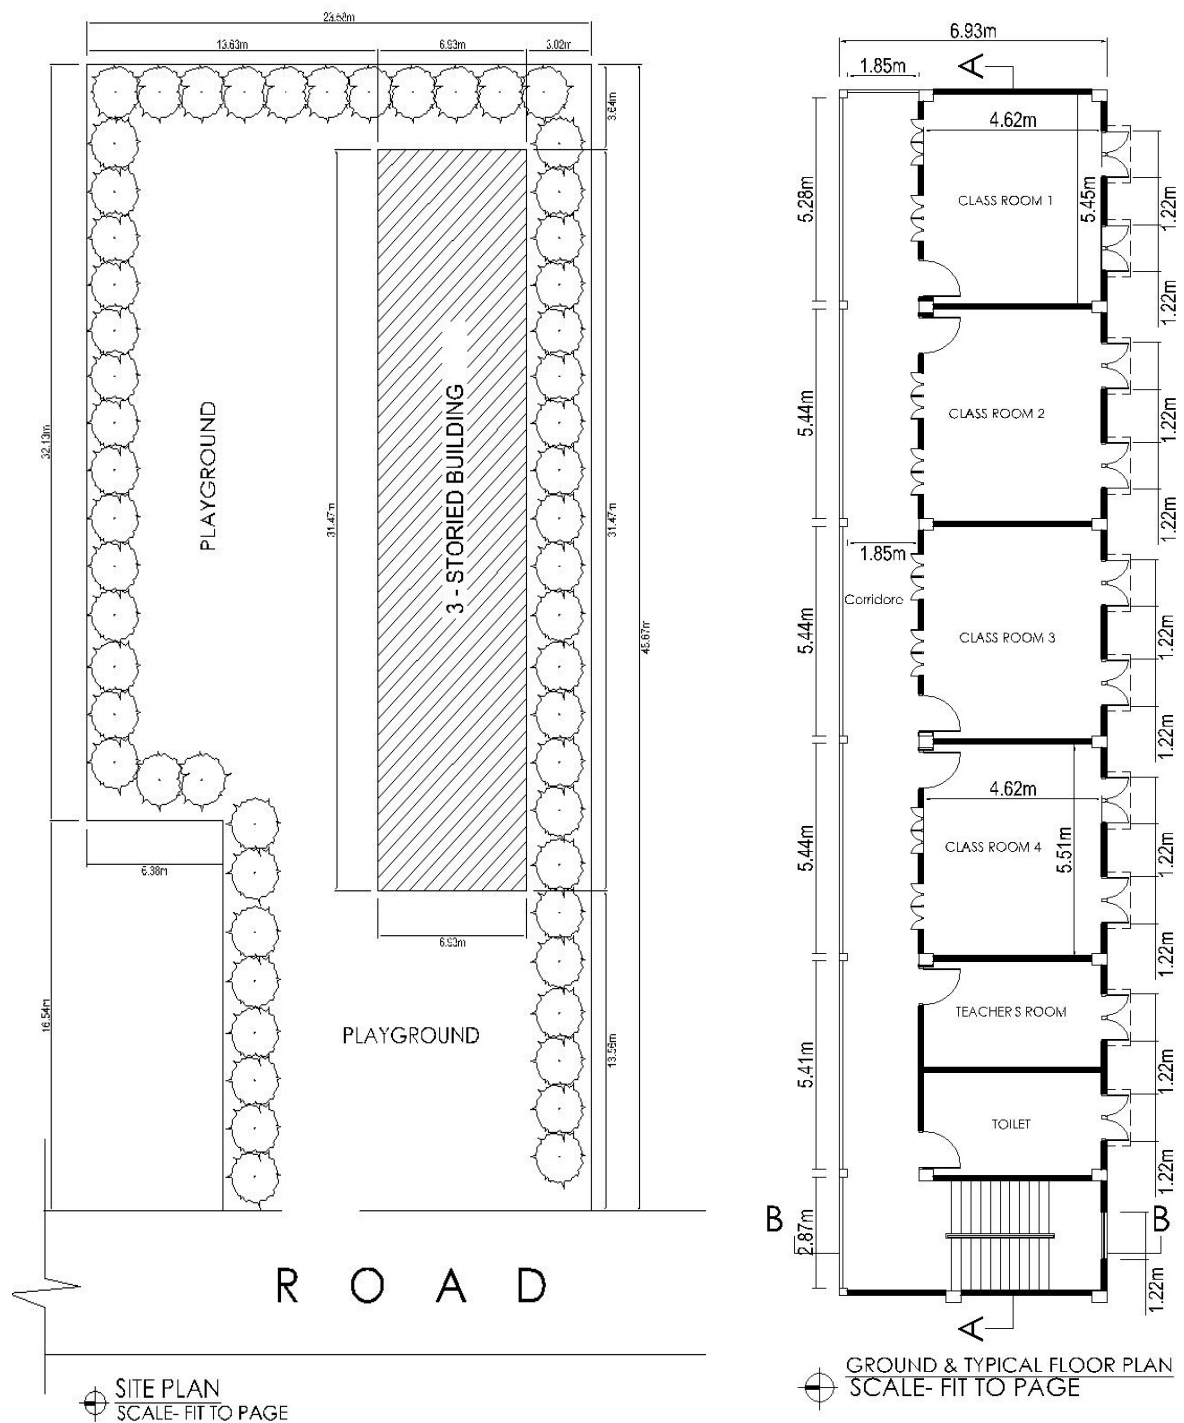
Site plan, Ground floor plan and typical floor plan of MADHUSHAHID GOVERNMENT PRIMARY SCHOOL . (Source: author)
